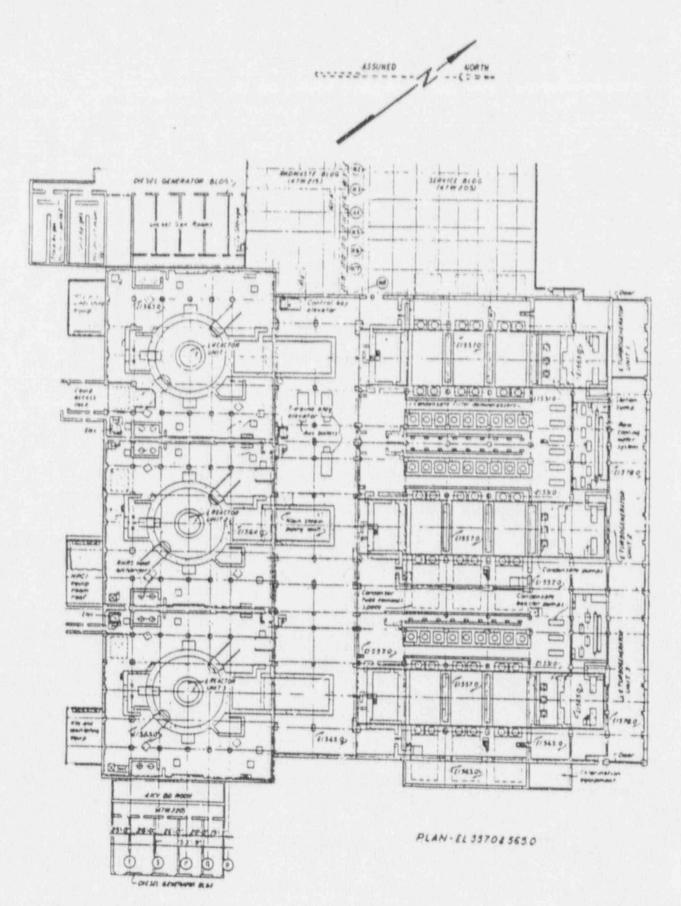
Overall Layout of the Browns Ferry Nuclear Plant, Elevations 557 ft. (Turbine Building) and 565 ft. (Reactor Building)
